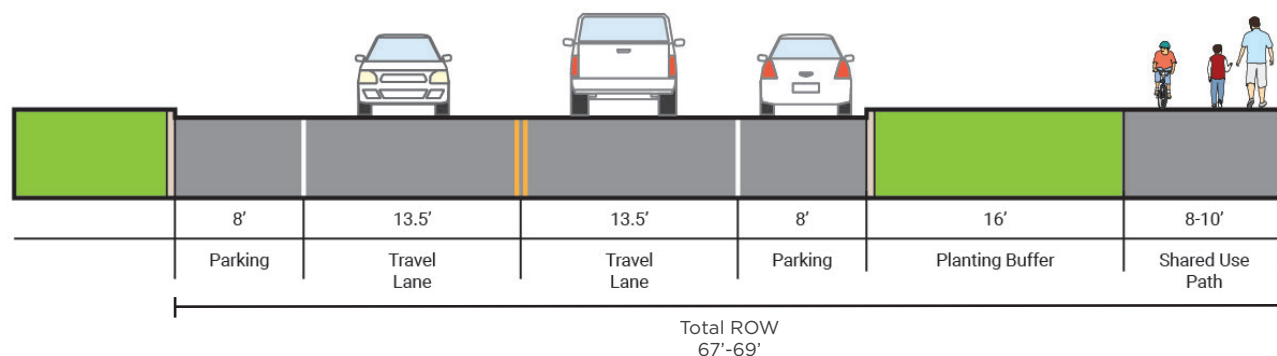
West Clifton Road Proposed Section (looking northbound)
